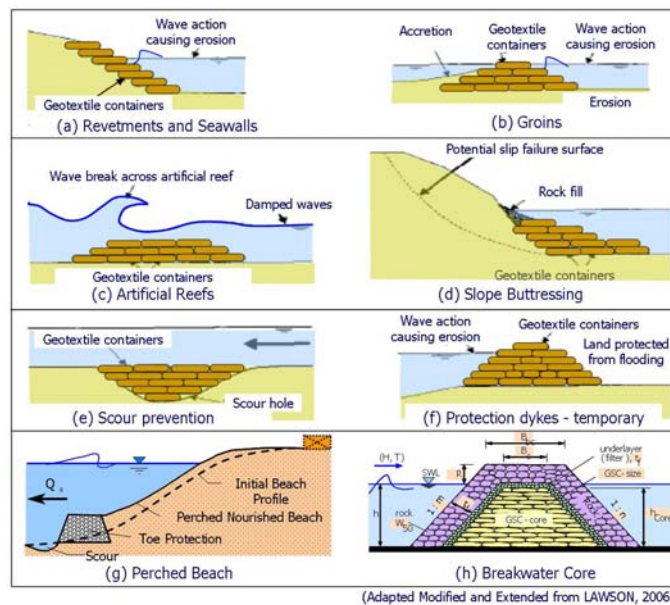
Coastal Engineering Applications of Geotextile Sand Containers
